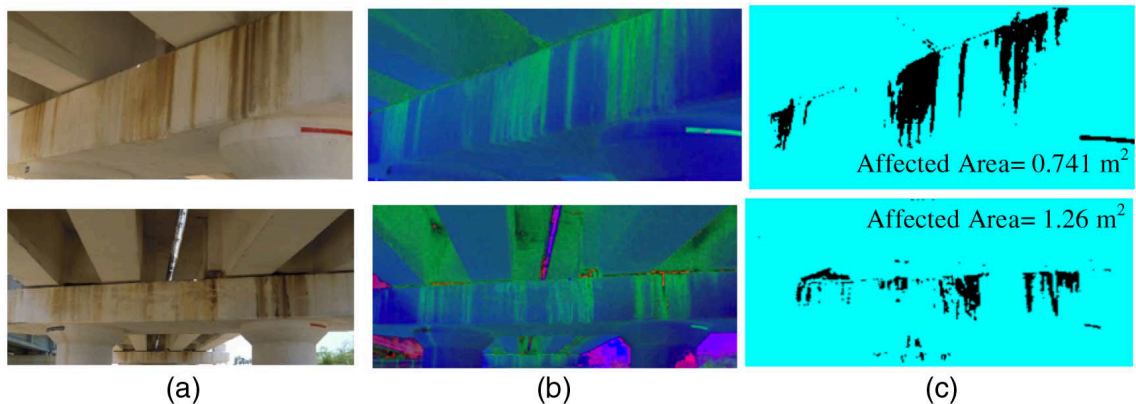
Pier cap of the railway bridge span 2 and 12: (a) site image; (b) HSV color space; (c) image showing distresses.
